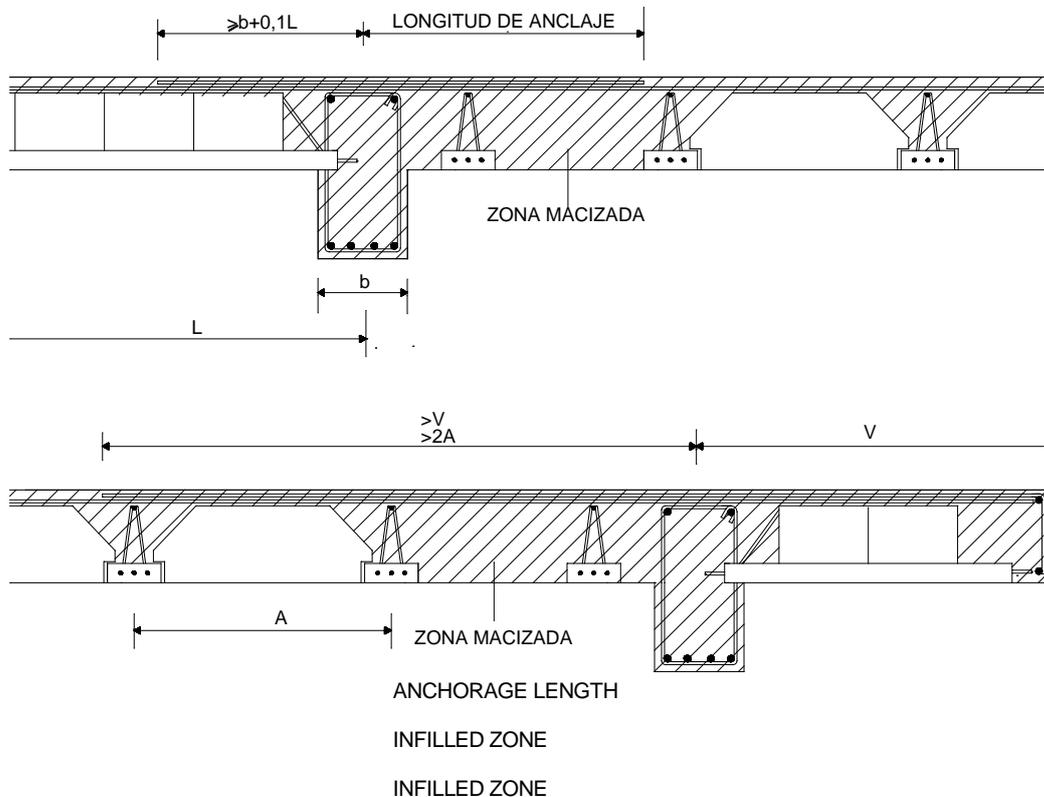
b Meeting point between perpendicular floor slabs
